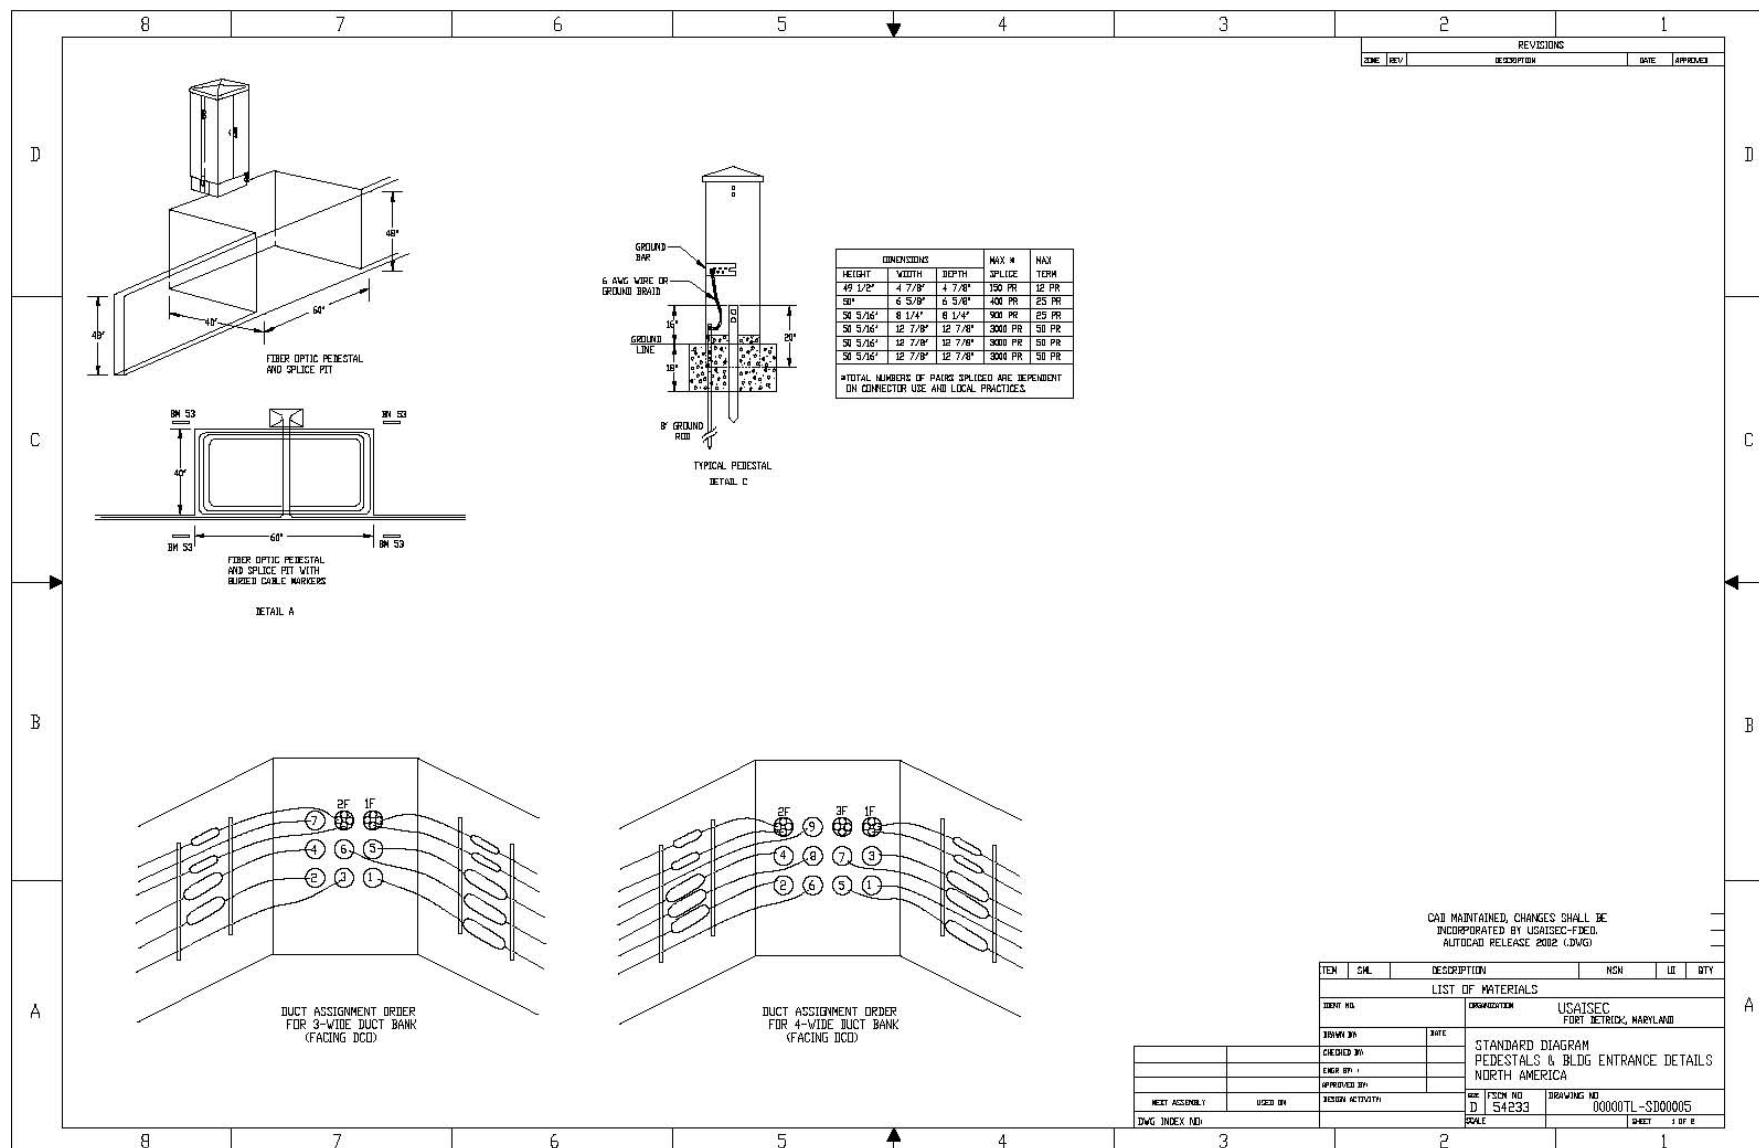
Pedestals and Building Entrance Details – North America (1 of 2)
